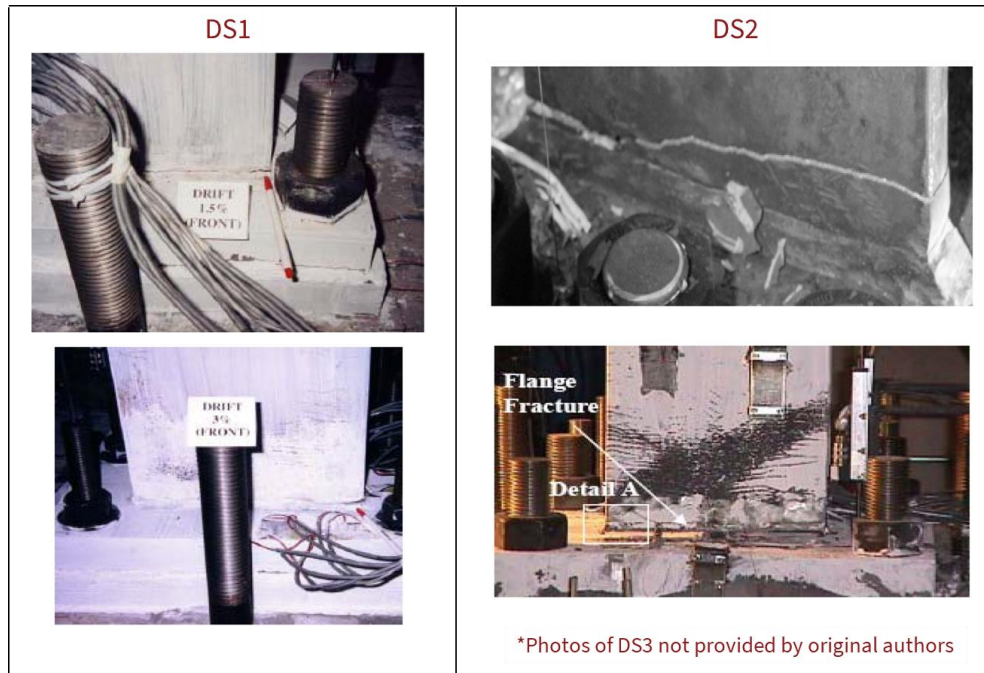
Illustration of the first two damage states for steel column baseplates (Deierlein and Victorsson, 2008).
